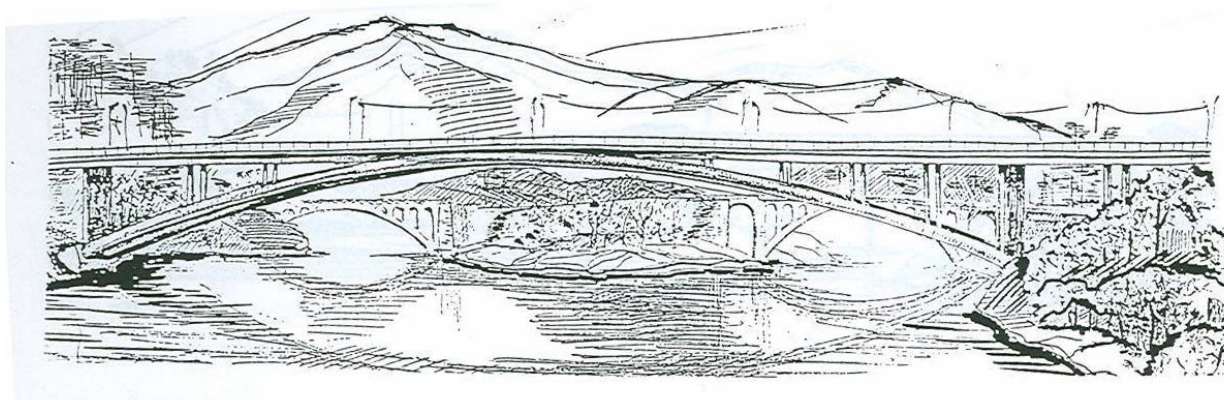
This arch bridge was built over Storestraumen in Skodje in 2000.
